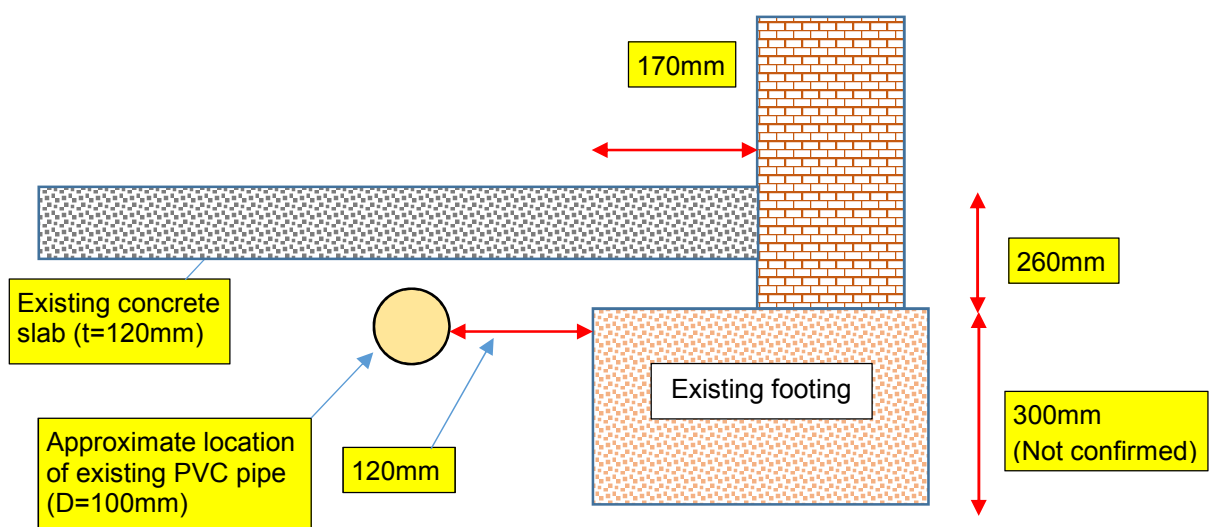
Schematic diagram of existing footing and adjacent to the Main Service Building
